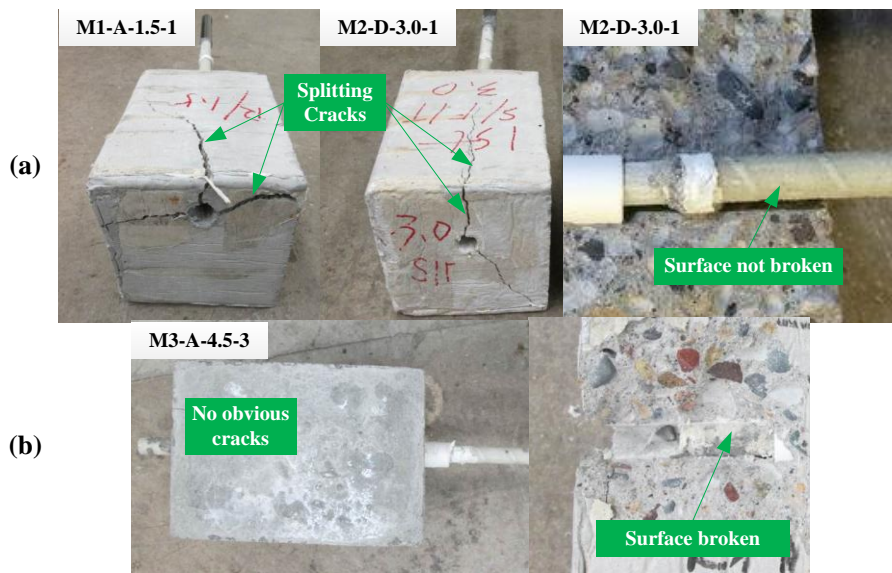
Typical failure modes for unconditioned and conditioned specimens: (a) splitting and (b) pullout failures
